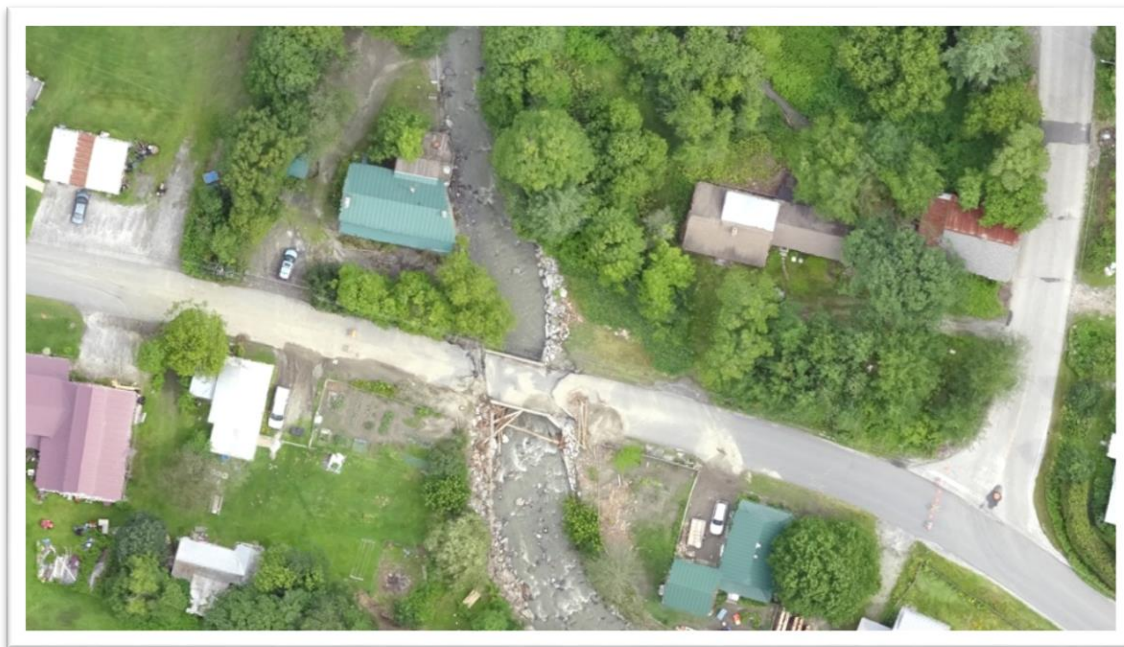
Damage to the bridge over the Great Brook sustained in July 2015.
